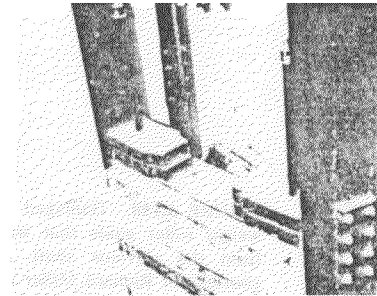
Air bar diffuser and flexible connectors dropped from damaged ceilings. Safety wires could have prevented excessive drooping of this type of equipment. Photograph courtesy of Hayakawa Associates and U.S. Department of Commerce, N.O.A.A.
